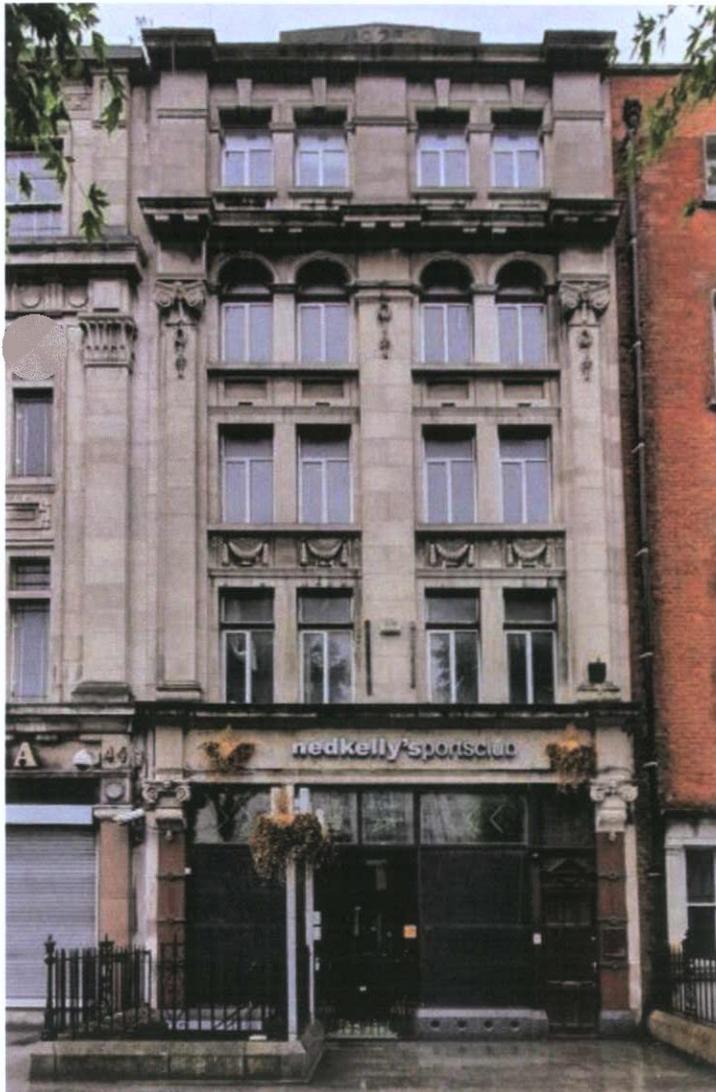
The façade of No.43 O’Connell Street Upper will be retained and repaired. The new development will be constructed behind the façade. On the upper levels the existing uPVC windows will be removed and timber casements will be installed.
